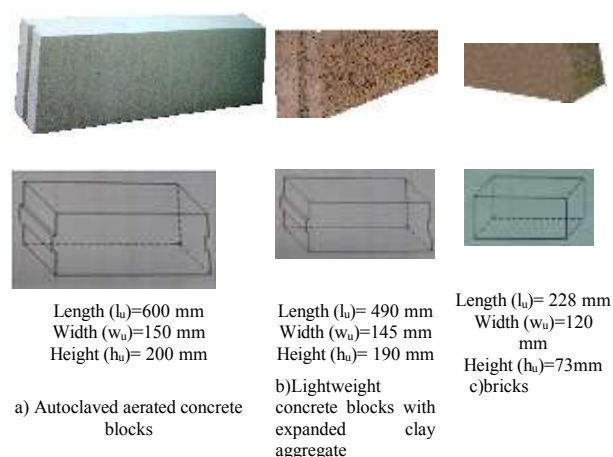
Schematic view of autoclaved aerated concrete blocks, lightweight concrete blocks with expanded clay aggregate and bricks, [31]
